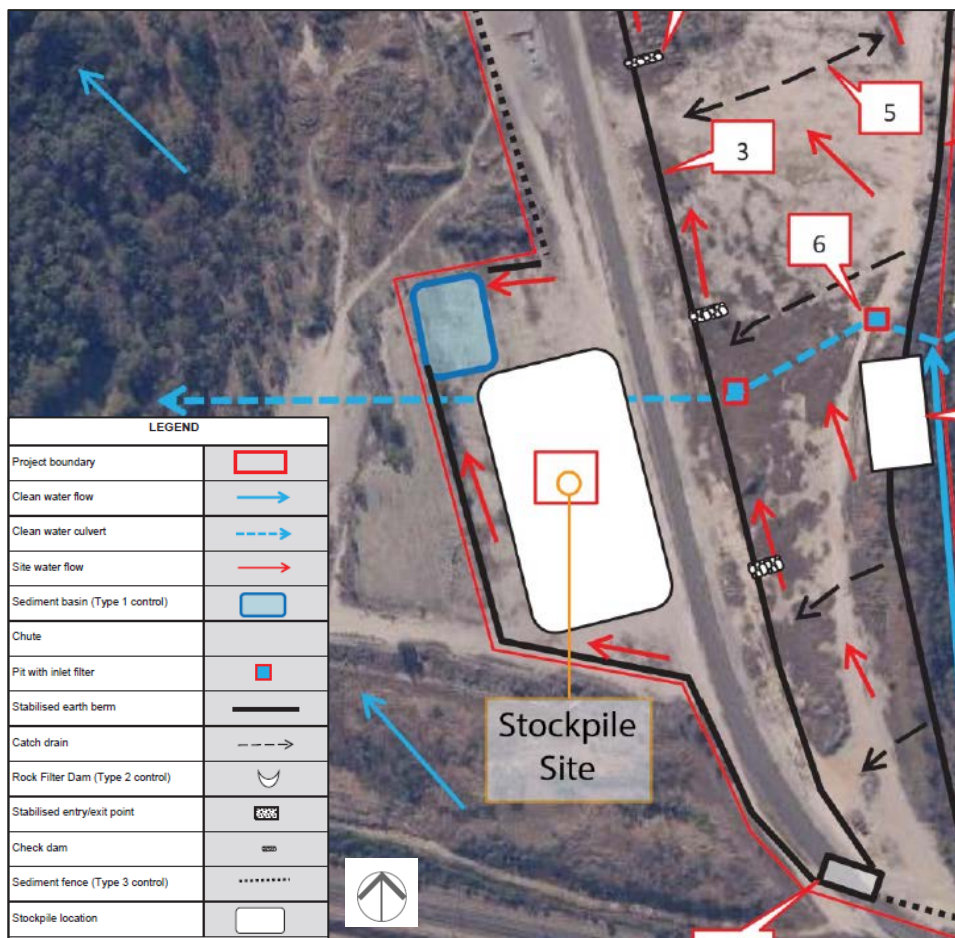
| Proposed stockpile site (green shading) (Source: Applicant's modification report)
